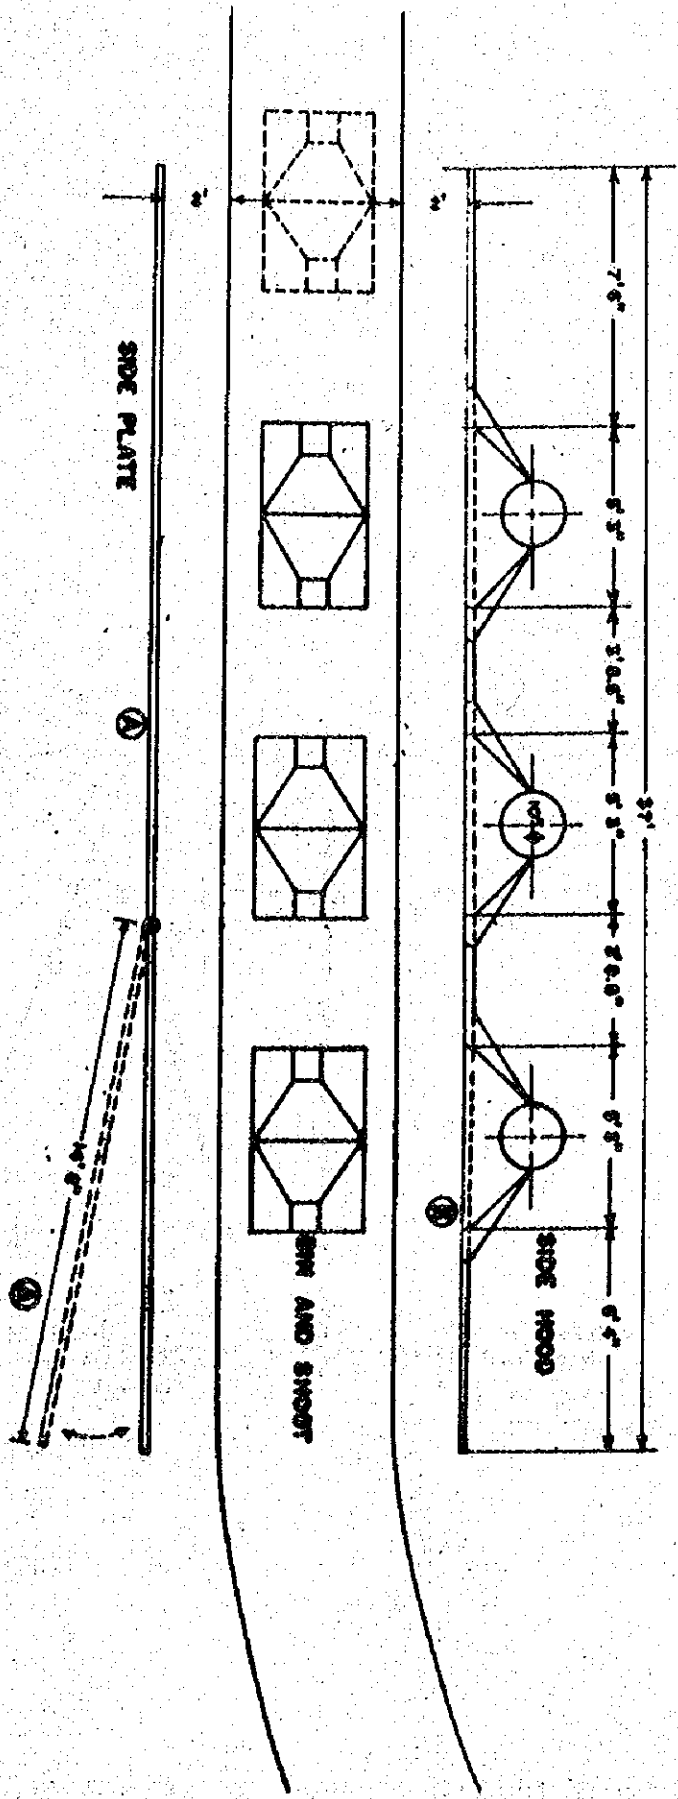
PLANE FIGURE OF EQUIPMENT
